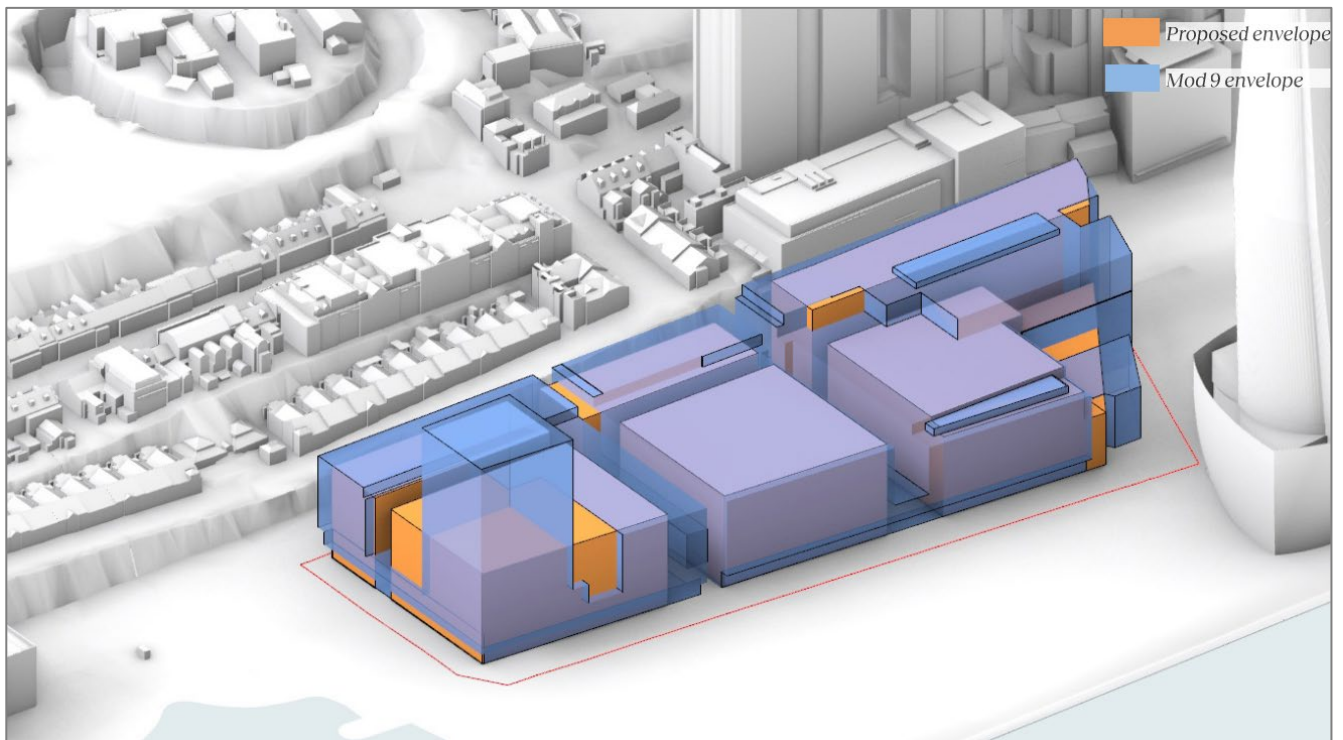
AMENDED CONCEPT BUILDING ENVELOPE WITH EXHIBITED CONCEPT BUILDING ENVELOPE (SJB)
